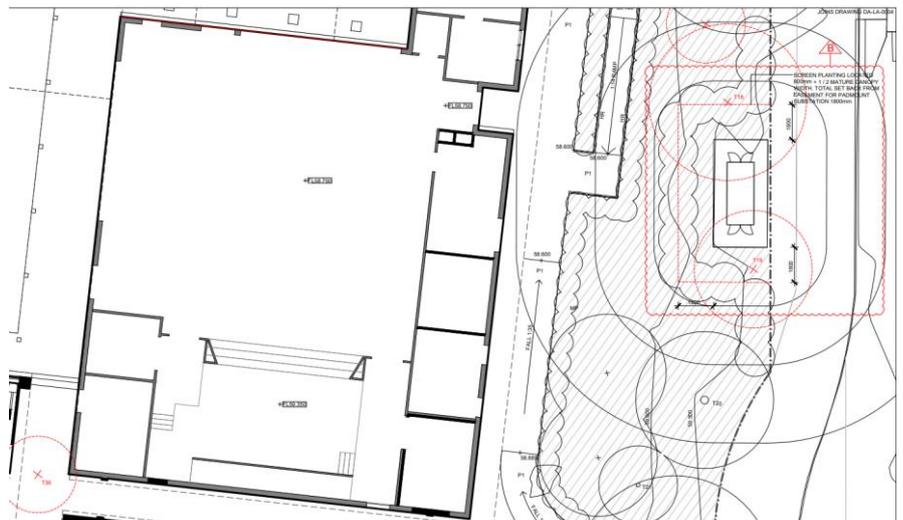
Detailed landscape plan showing changes to vegetation surrounding the substation
